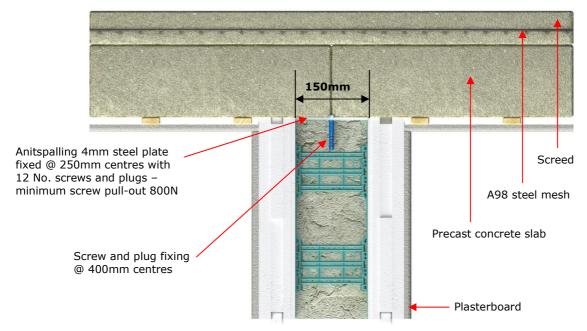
Internal Load Bearing Wall with Concrete Slab and Antispalling Steel Plate
